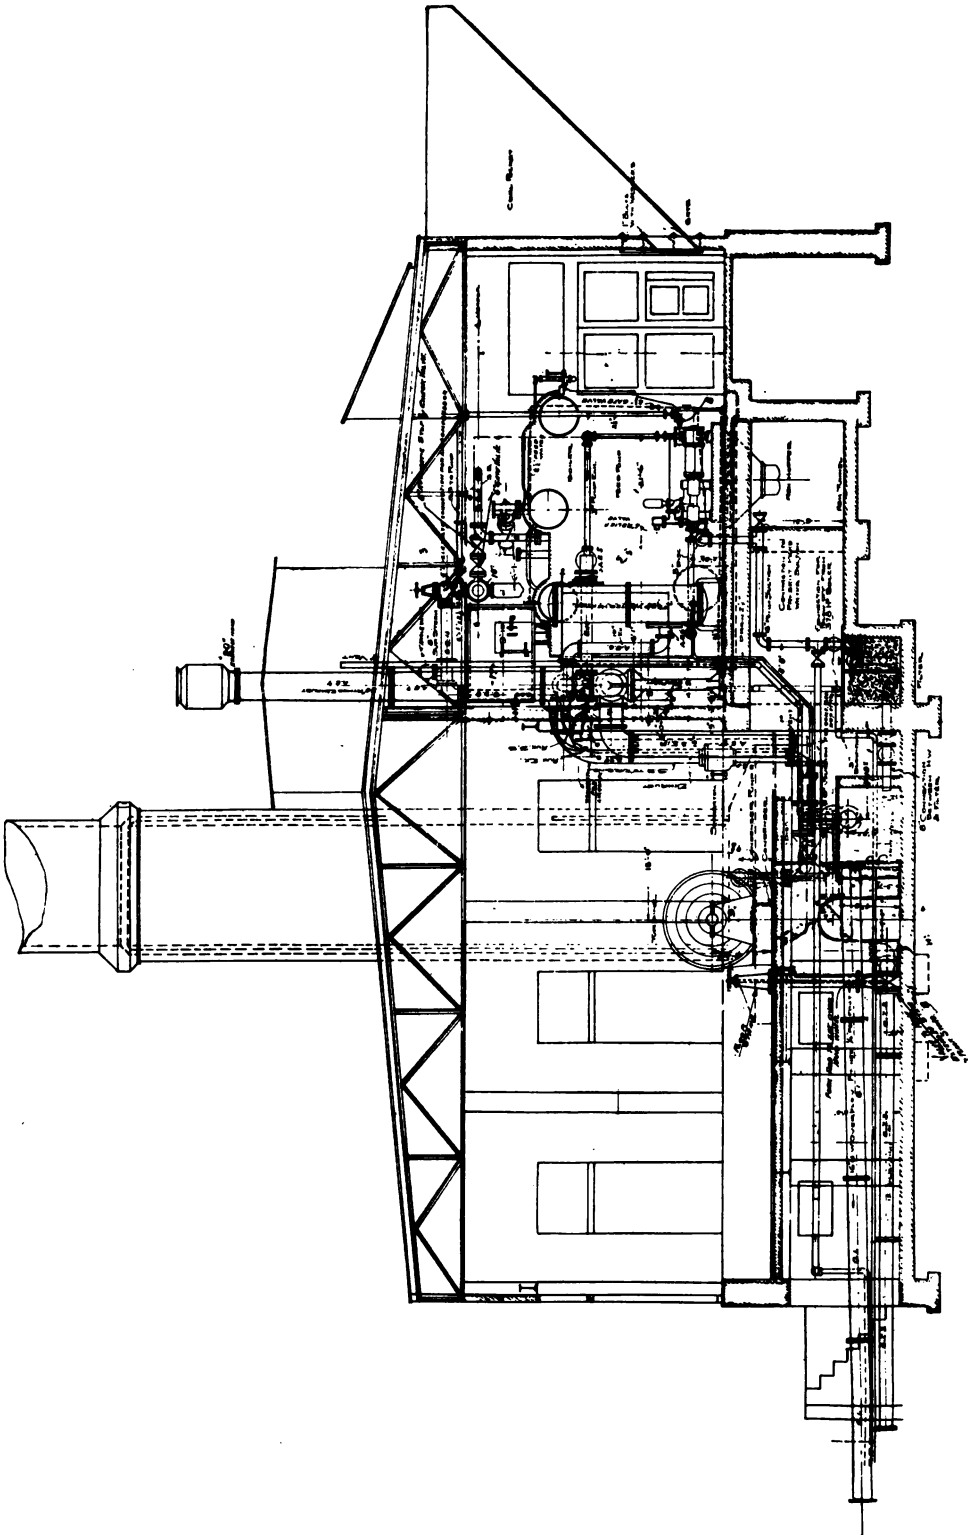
Cross Section, Boiler and Engine Room, Helderberg Cement Co.
